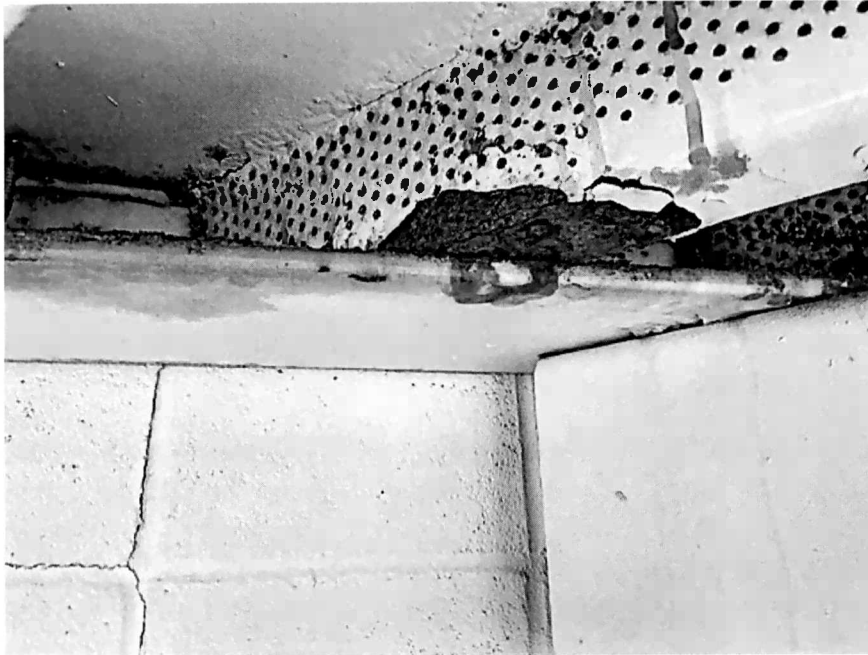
Severely damaged roof deck bearing at north-west wall
